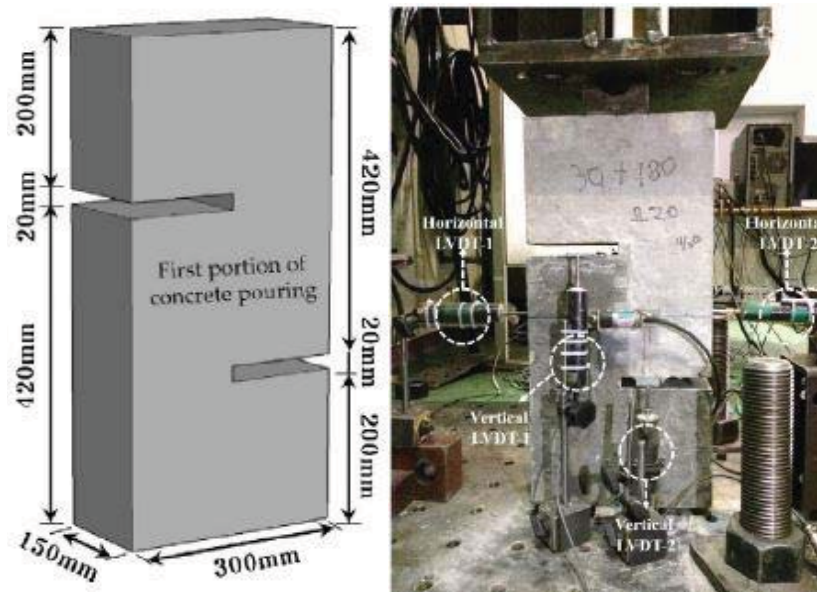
Monolithic L-Shape UHPC Specimen Test Setup and Specimen Dimensions (Jang et al. 2017)
